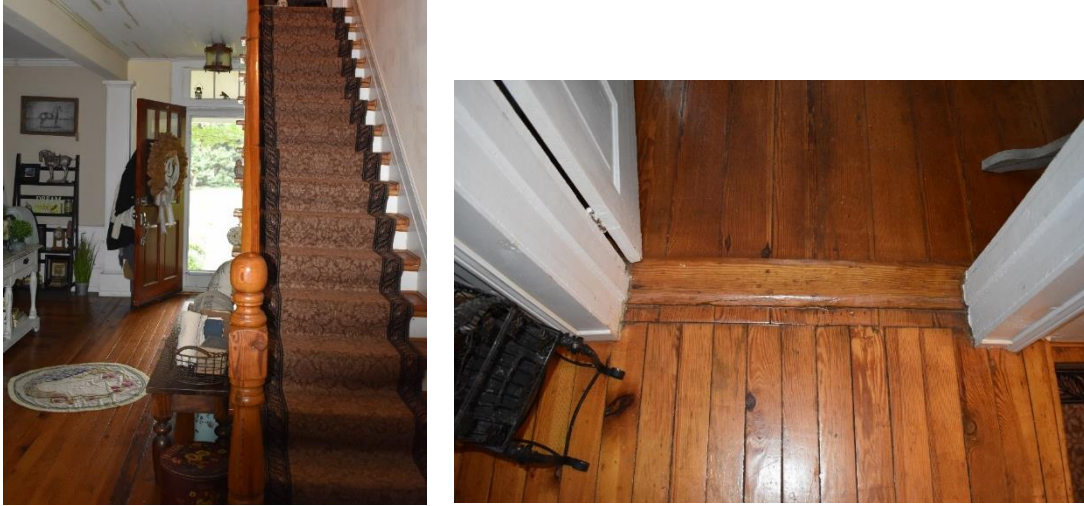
Left, view of stair, looking north; right, detail view of floorboards at top of stair landing
